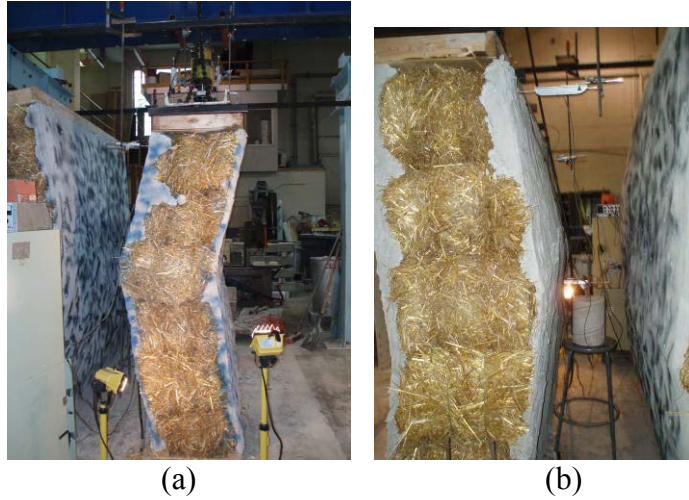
Failure of Wall 10 (cement plaster, bales flat): (a) Side view; (b) Isometric view.
